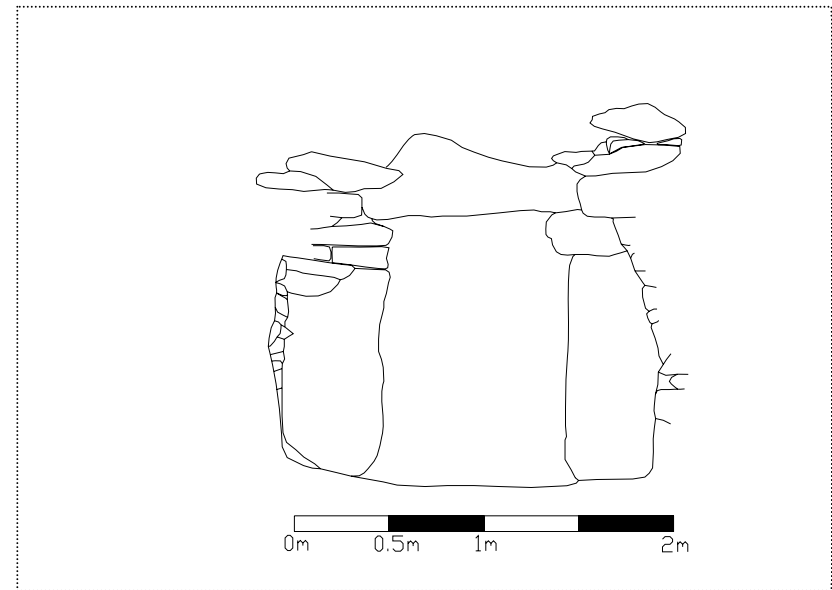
North facing elevation of lintelled doorway at junction between gallery 3 & gallery 4
